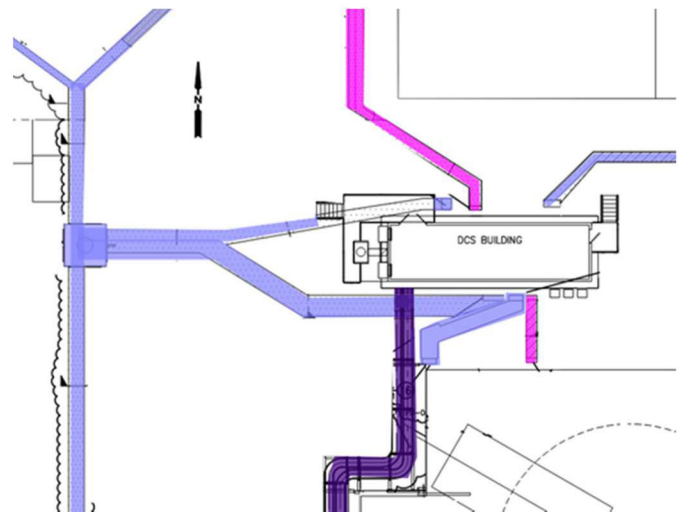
RIE Building – Plan View W/ Duct Bank & Cable Tray
